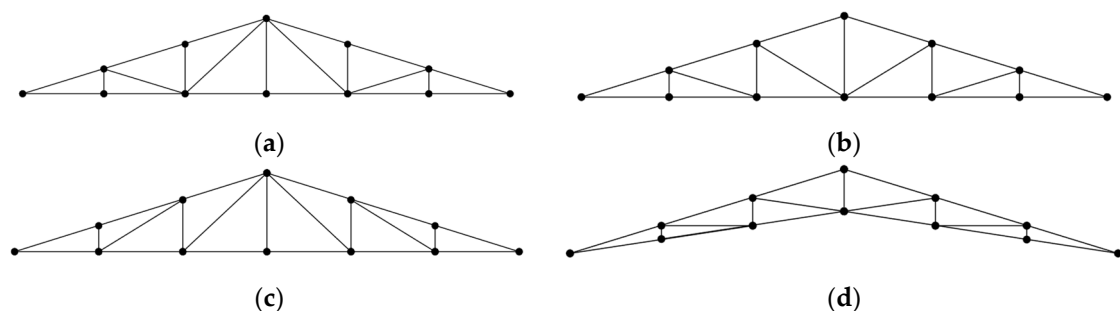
Triangular trusses: (a) modified Fan Truss, (b) Howe Truss, (c) Pratt Truss, and (d) scissor Truss.
